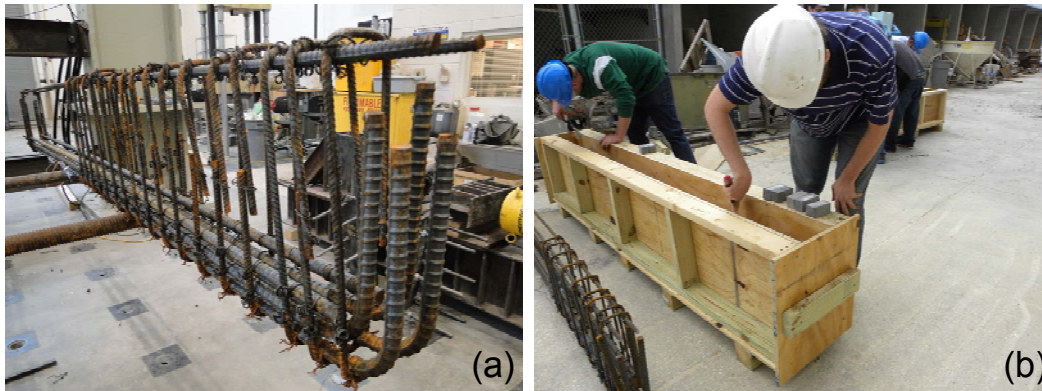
Typical photo of reinforcement caging and formwork for SFRC and PC beams at the University of Texas at Arlington Civil Engineering Lab
